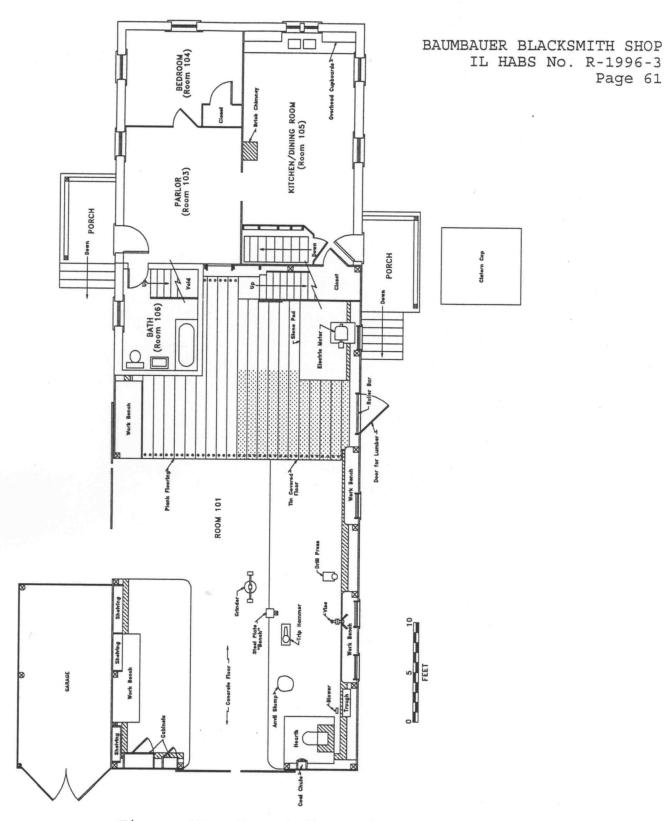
Ground floor plan of the Baumbauer Blacksmith Shop, showing addition of bathroom and basement stairway (late 1920s) and more recent modifications.
